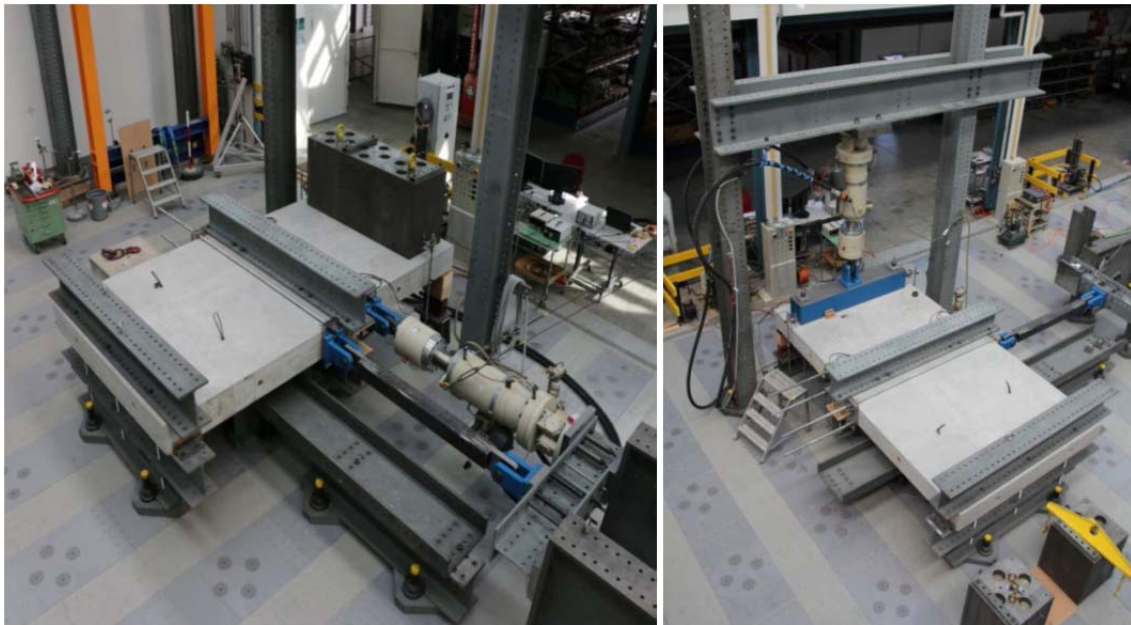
Pictures arrangement of test setup (horizontal and vertical)
